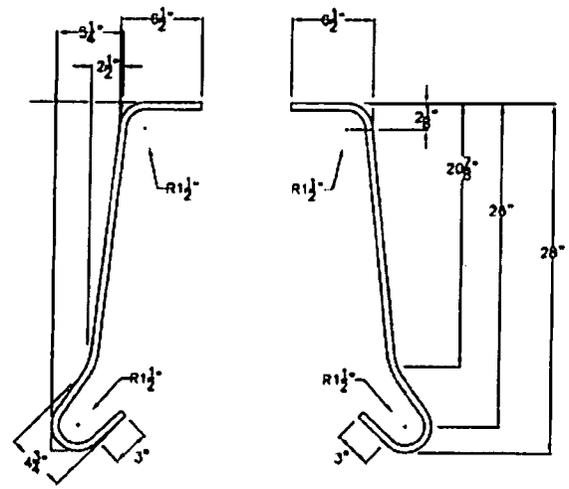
Details of the pinned F-shape barrier -- rebar placement.
